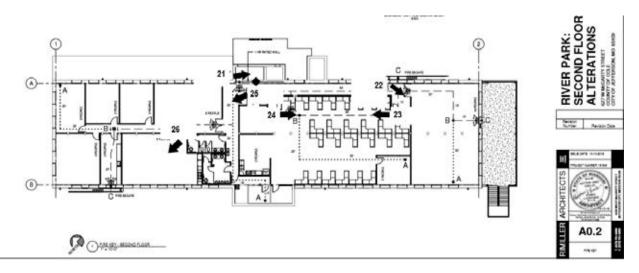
Photo Key – Second Floor. Source of plan: R.I. Miller Architects.
